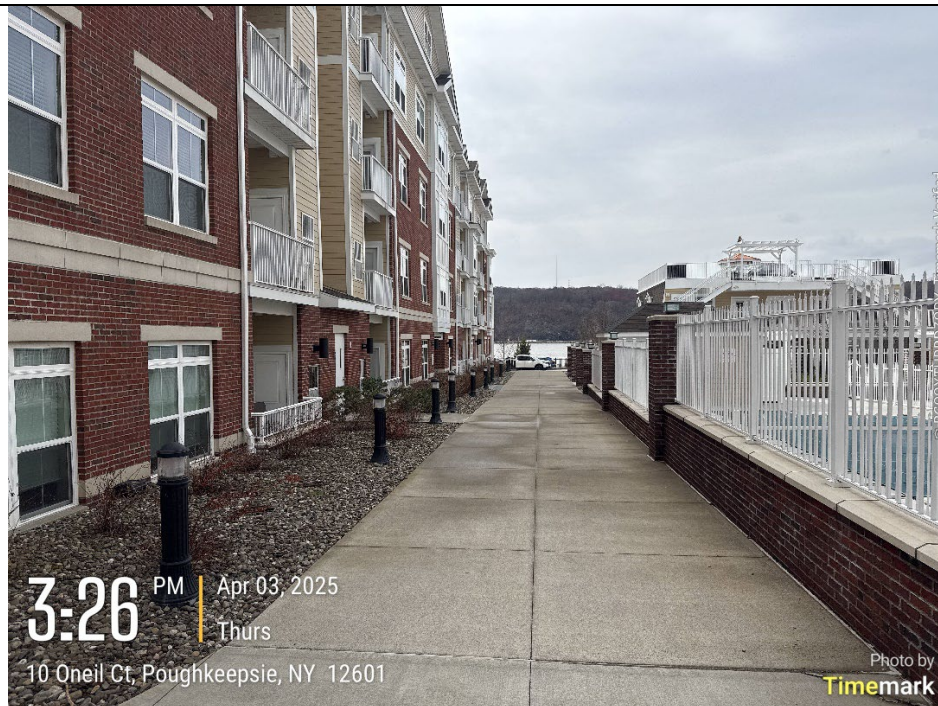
Photo showing completed areas of cap around Site buildings, facing west
